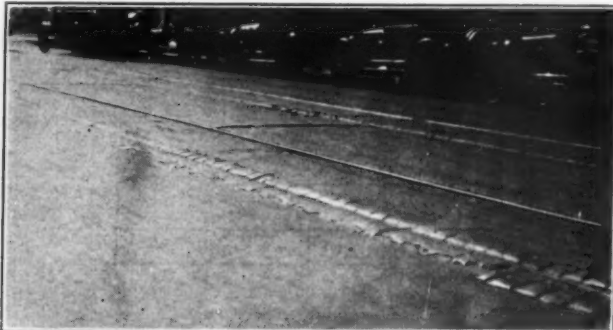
STONE BLOCKS LAID ALONG RAILS, WITH CONCRETE PAVEMENT BETWEEN RAILS.
